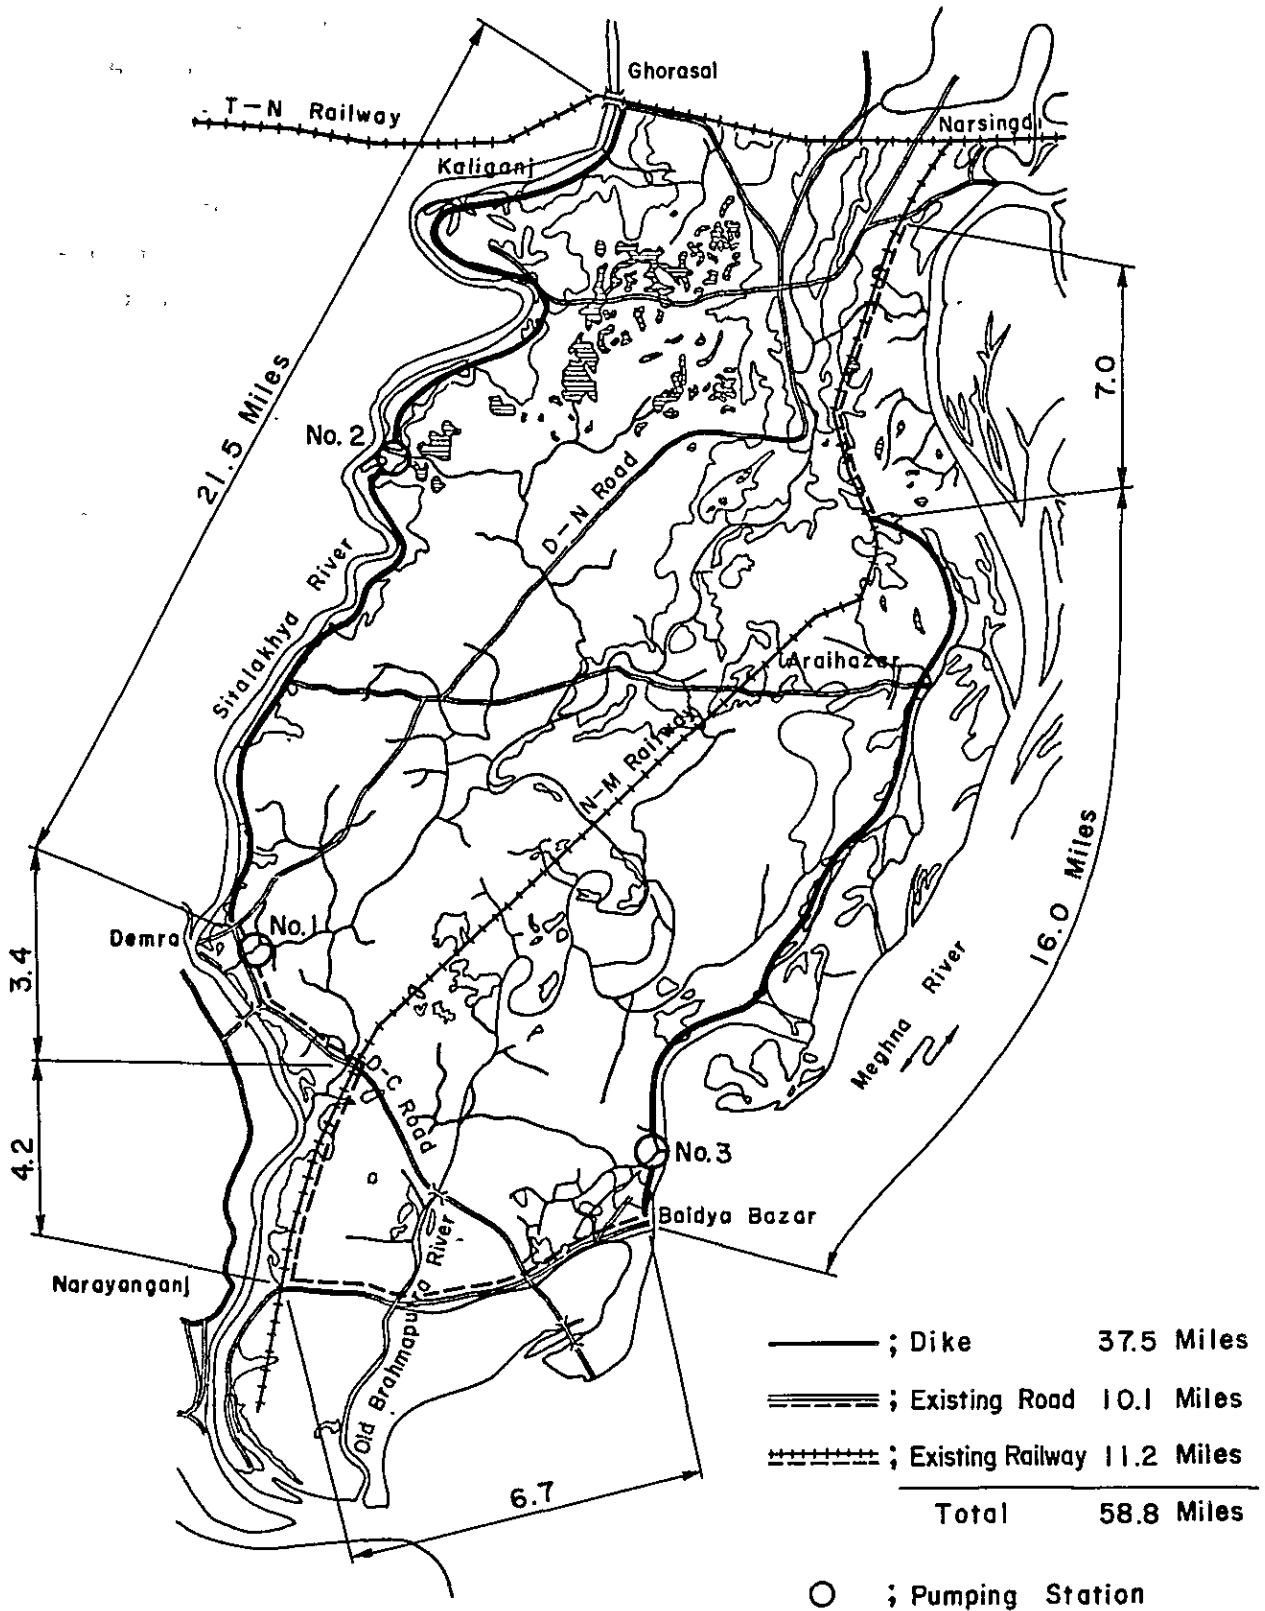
PLAN B- PROJECT AREA 111,600 Ac
